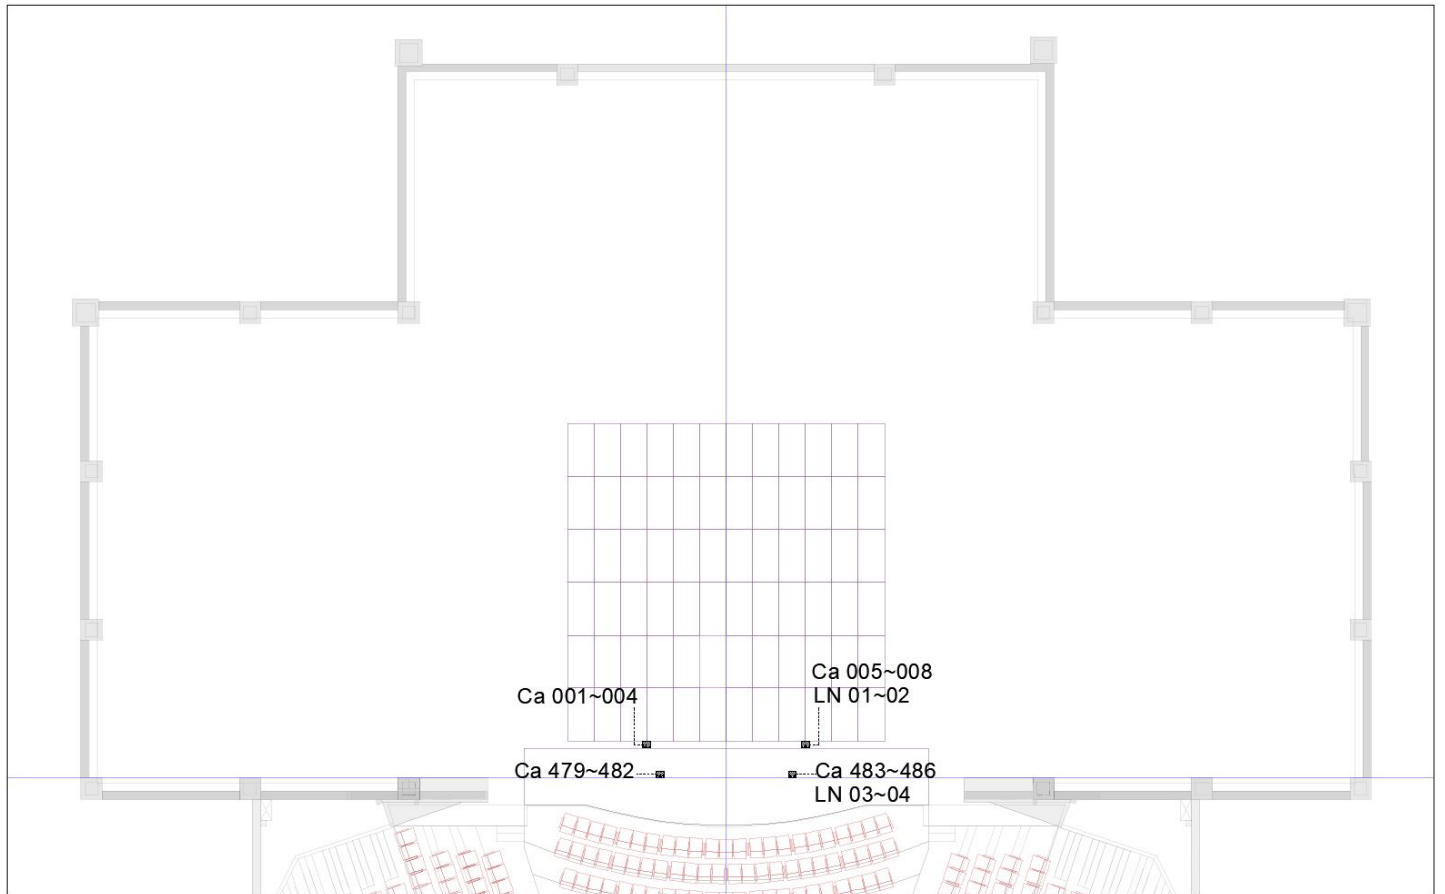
Stage Traps Room and Orchestra Pit Elevation Platform Circuit Layout
